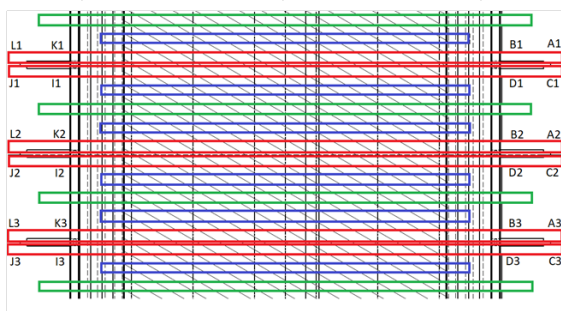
Scheme of the layout of wooden elements of cross members and road elements.
